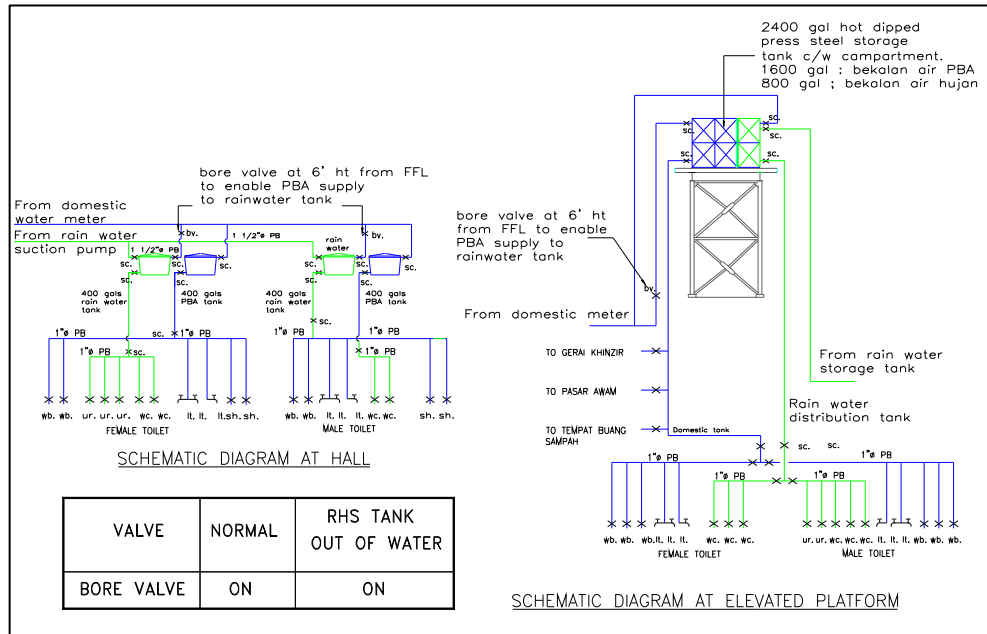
Schematic Diagram at Hall (Left) and Elevated Platform (Right) (MPSP, 2008)
